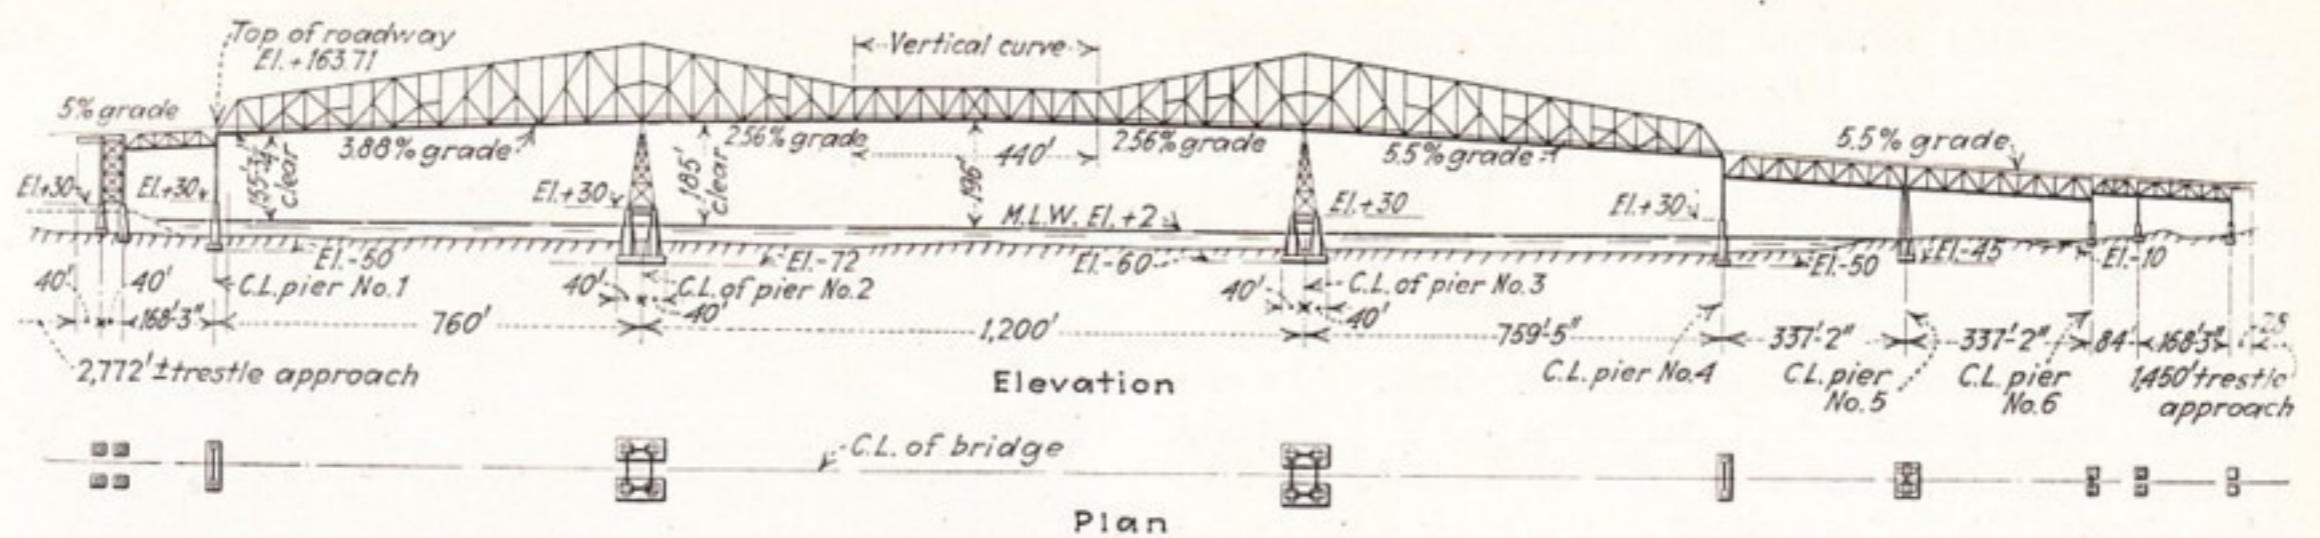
PLAN AND ELEVATION OF COLUMBIA RIVER-LONGVIEW BRIDGE
